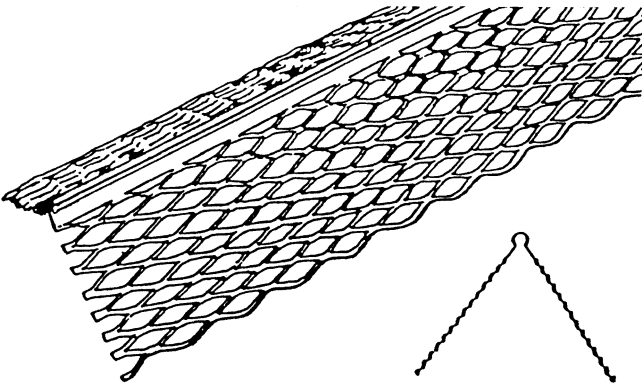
Expanded-flange corner bead (courtesy of Alabama Metal Industries Co., Birmingham, AL).
